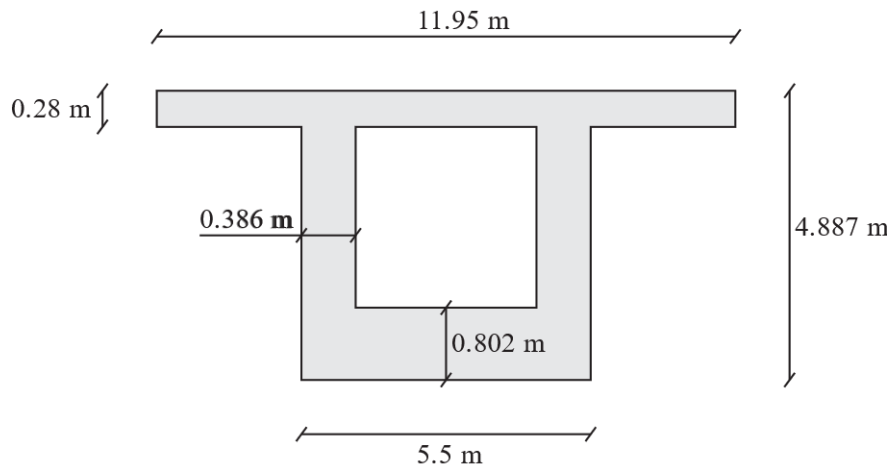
Cross-section of the Alvik bridge near pier 4.
